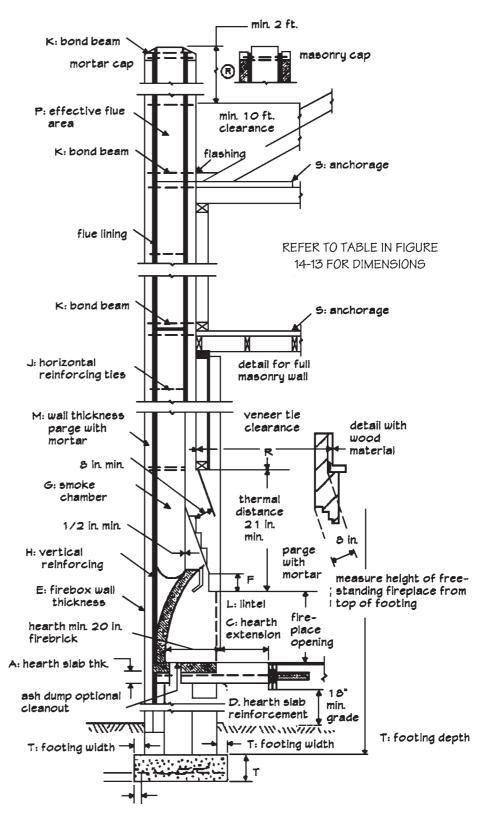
Section detail, fireplace on wood framing. (*From* International Building Code 2003.)
